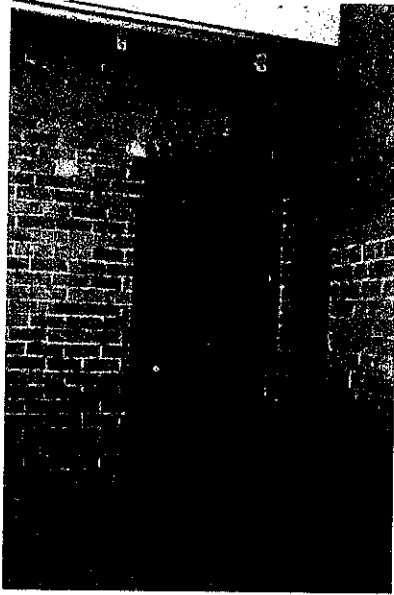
Exterior, east elevation. Door detail, vestry.
